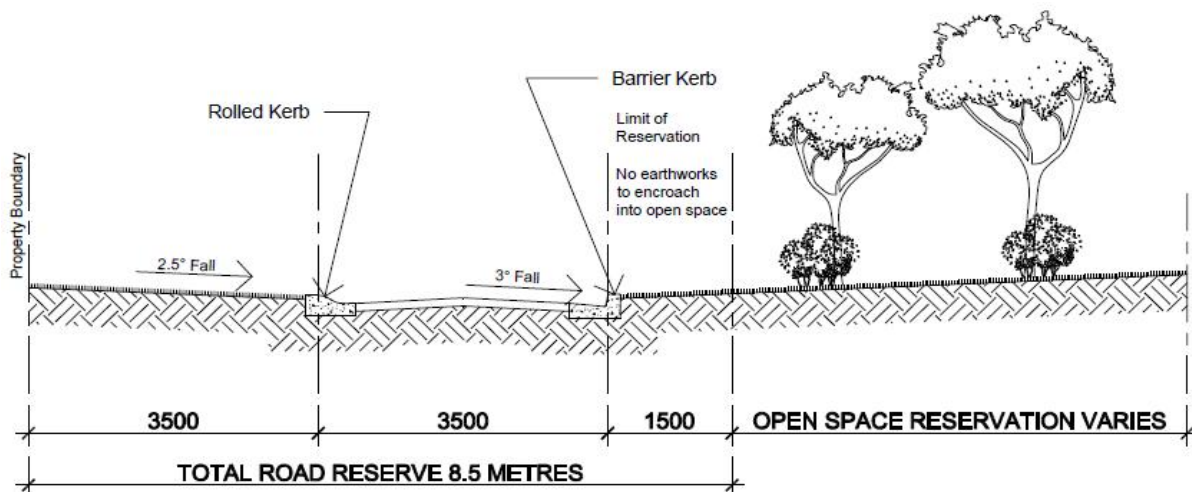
Access Place – One Way <sup>(4)</sup> (Adjacent to Public open Space)
